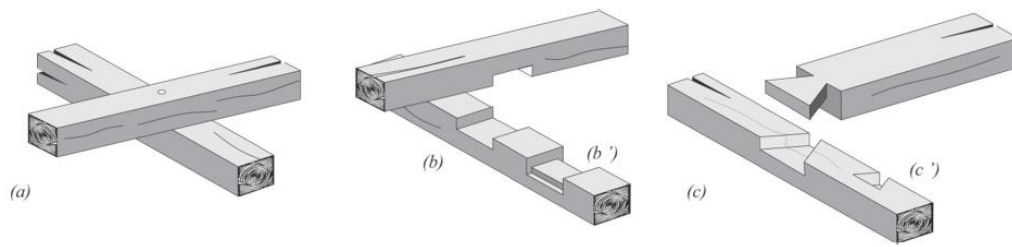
(a) Full lap joint. (b) Half-lap joint. (c) Dovetail-lap joint. (Branco, 2015)
